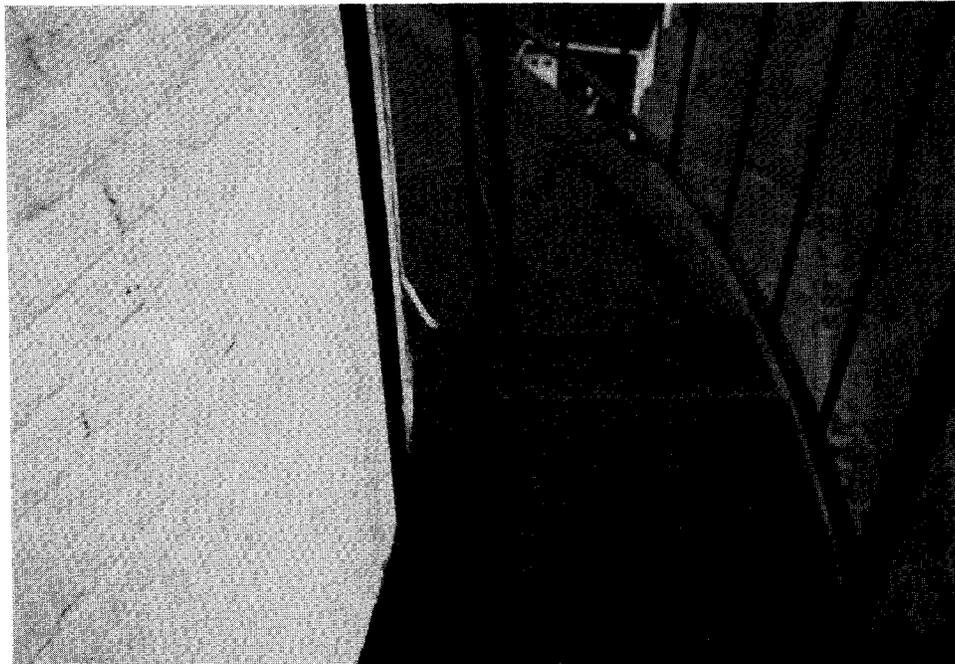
Tower, shifted granite section of Watch Gallery floor.
